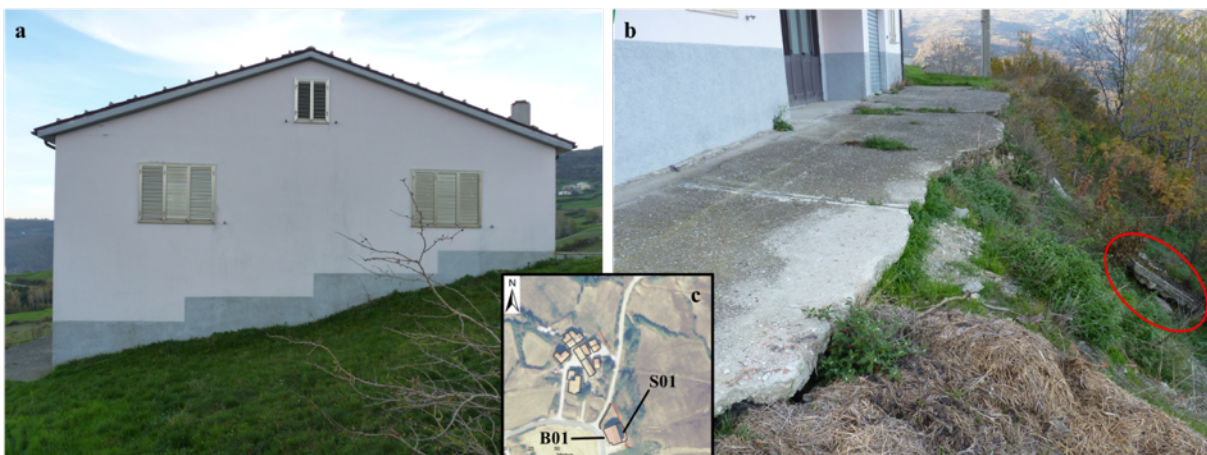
North façade (a) of the building (B01) located on the crown of the landslide with in front a several damage concrete sidewalk (b) partially collapsed (red circle).
